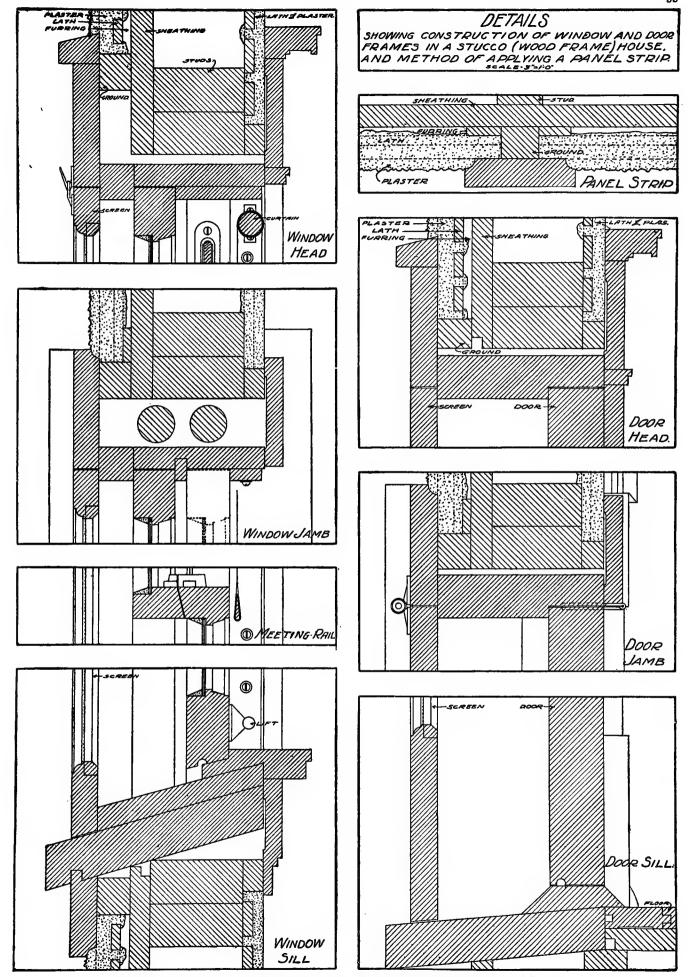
FRAMING FOR CEMENT PLASTER HOUSES
